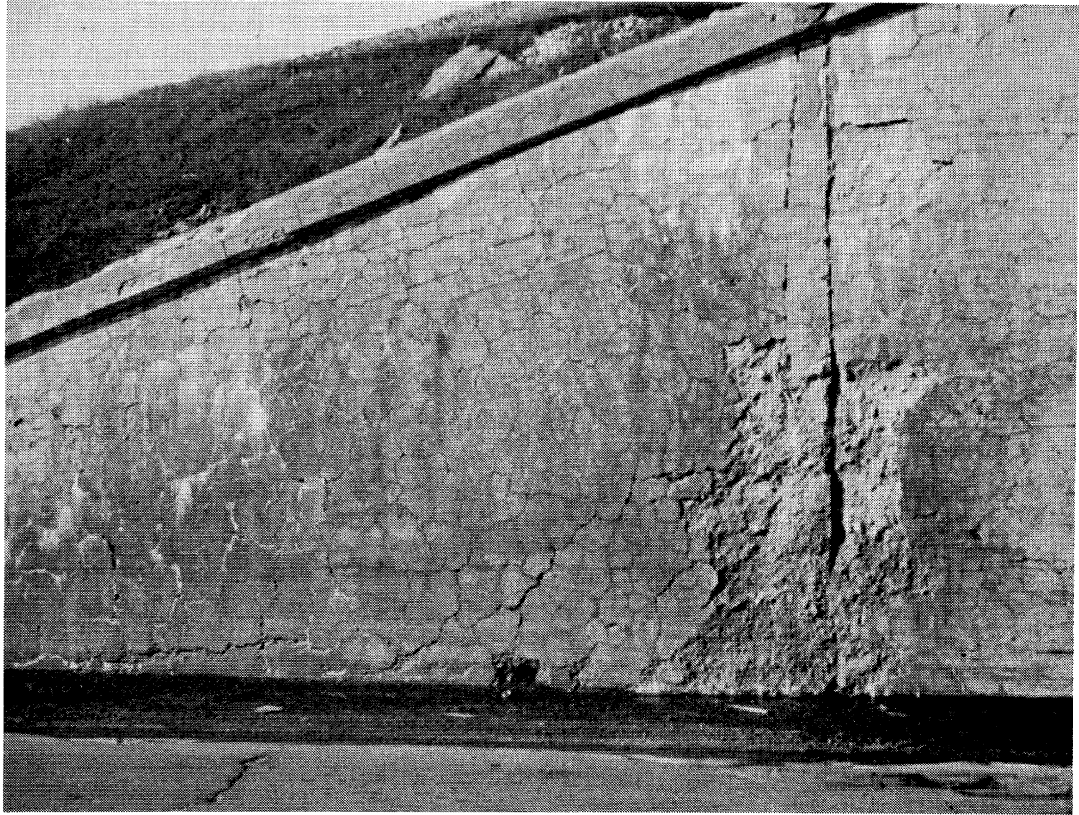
Map or pattern cracking of wing wall and bridge abutment, Valleyfield, P.Q. This is caused by alkali-silica reaction with Potsdam sandstone. Note leaching of cement and spalling due to compression at construction joint (built about 1930).
